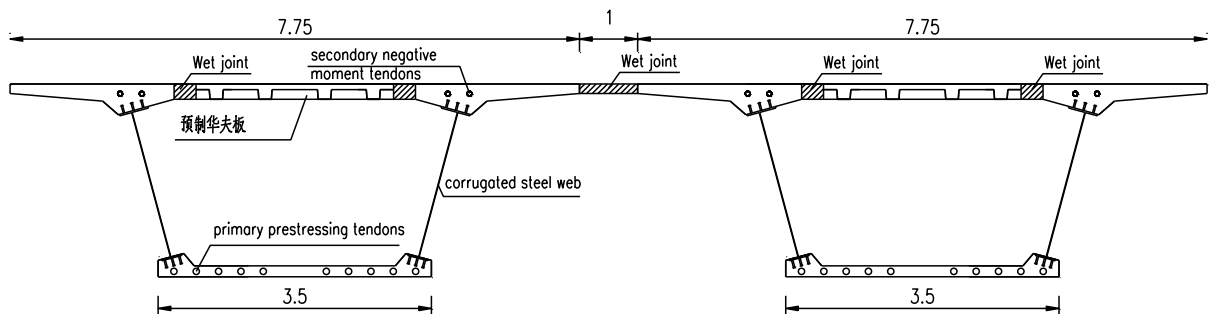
Schematic diagram of composite beam structure section – system IV (Unit: m)
